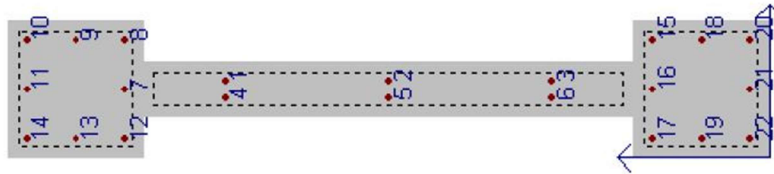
Control wall cross-section and reinforcement details modelled using RC-Section Software
